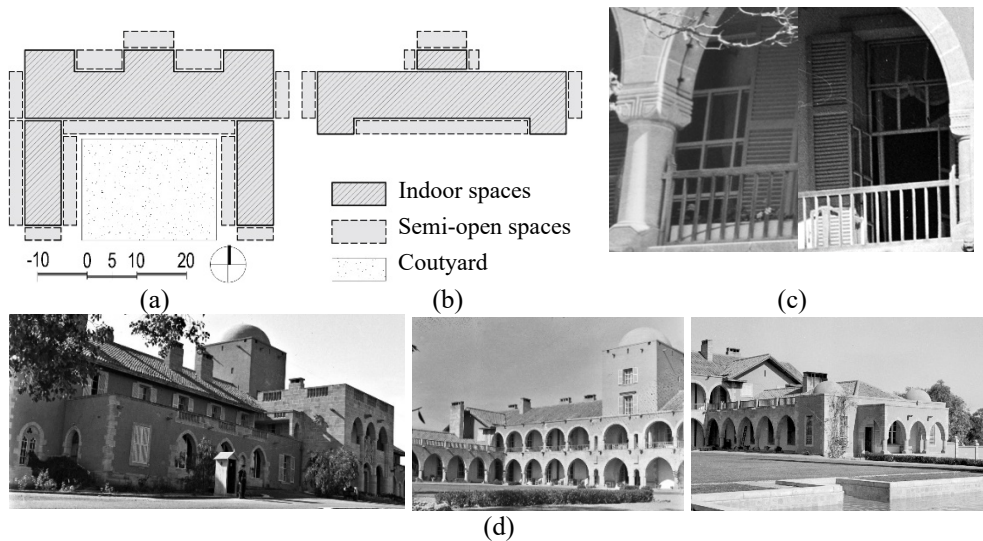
Government House schematic plan views. (a) Ground floor plan view; (b) First floor plan view; (c) Left: double-hang window – leaves in center position\*. Right: door – top window slightly open\*\*; and (d) Government House photographs from the 1950s\*. (Source: \* PIO, Photo by Felix Yaxis; \*\* PIO.)
